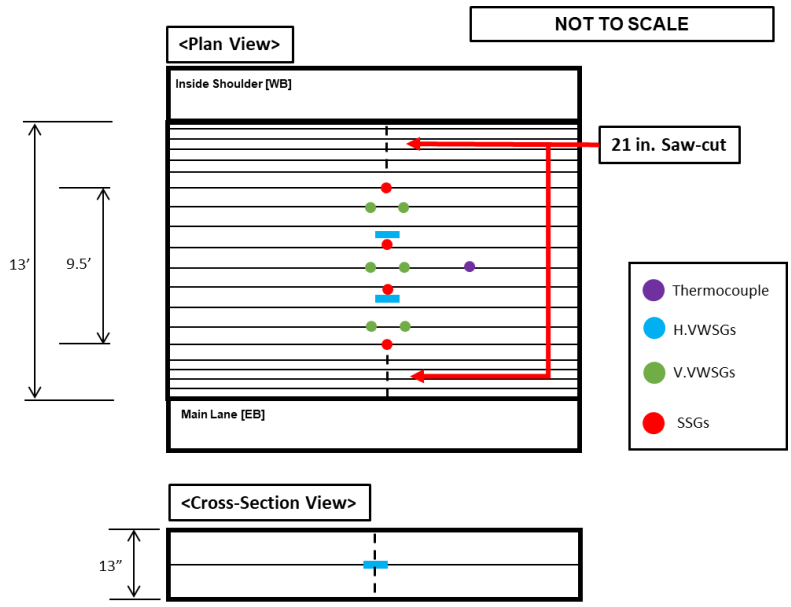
Plan view of typical gauge installation location in San Antonio
